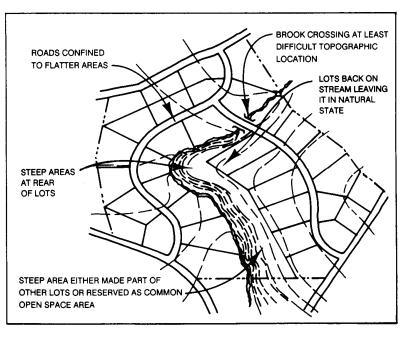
LAYOUT OF ROADS AND LOTS
